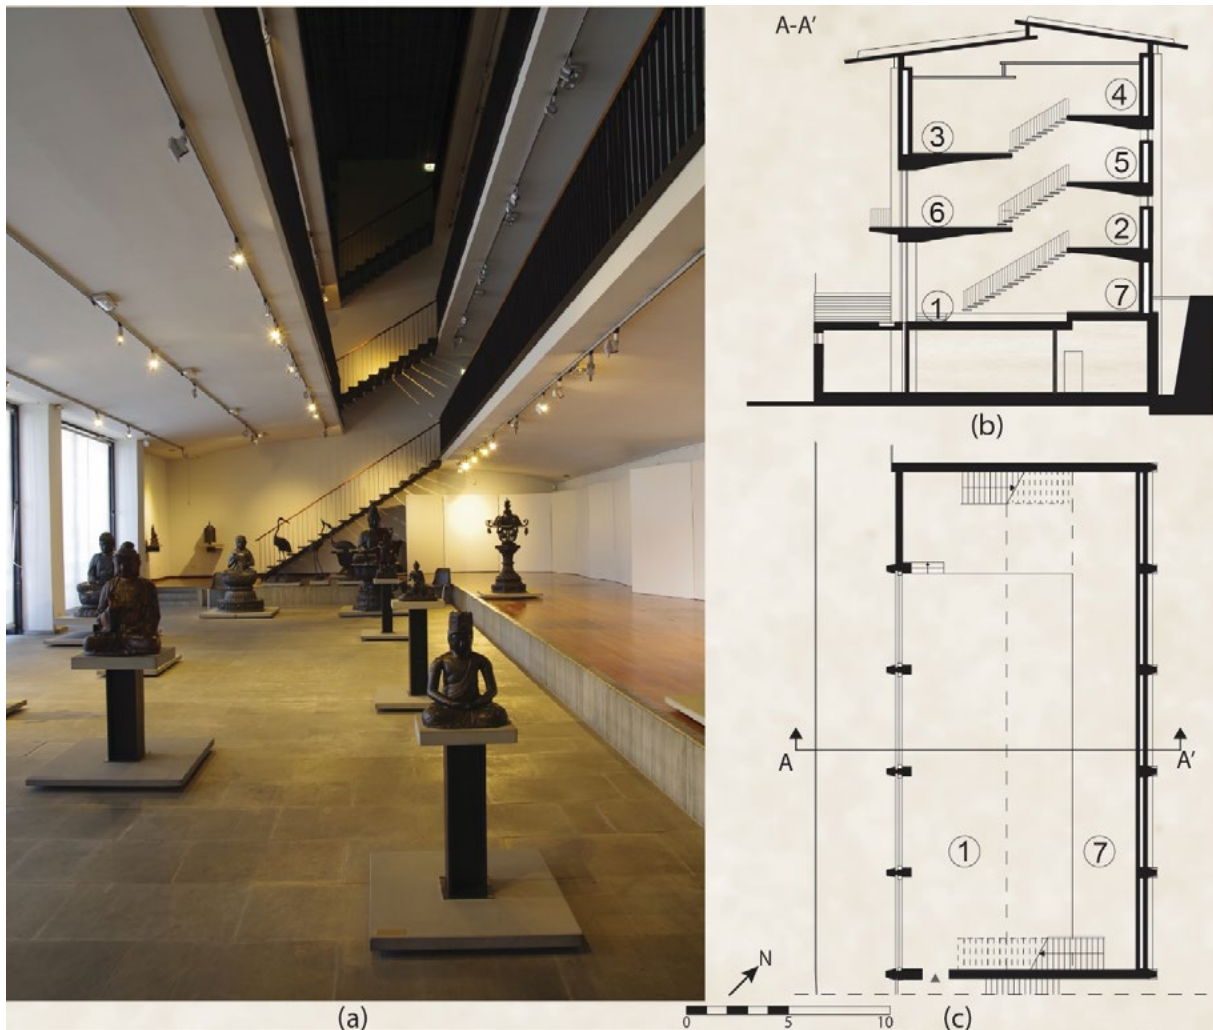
The Edoardo Chiossone Museum of Oriental Art (Mario Labò. Genoa, Italy, 1948-1971): a) Ground floor photo; b) Section AA'; c) Ground floor plan (by Author)
